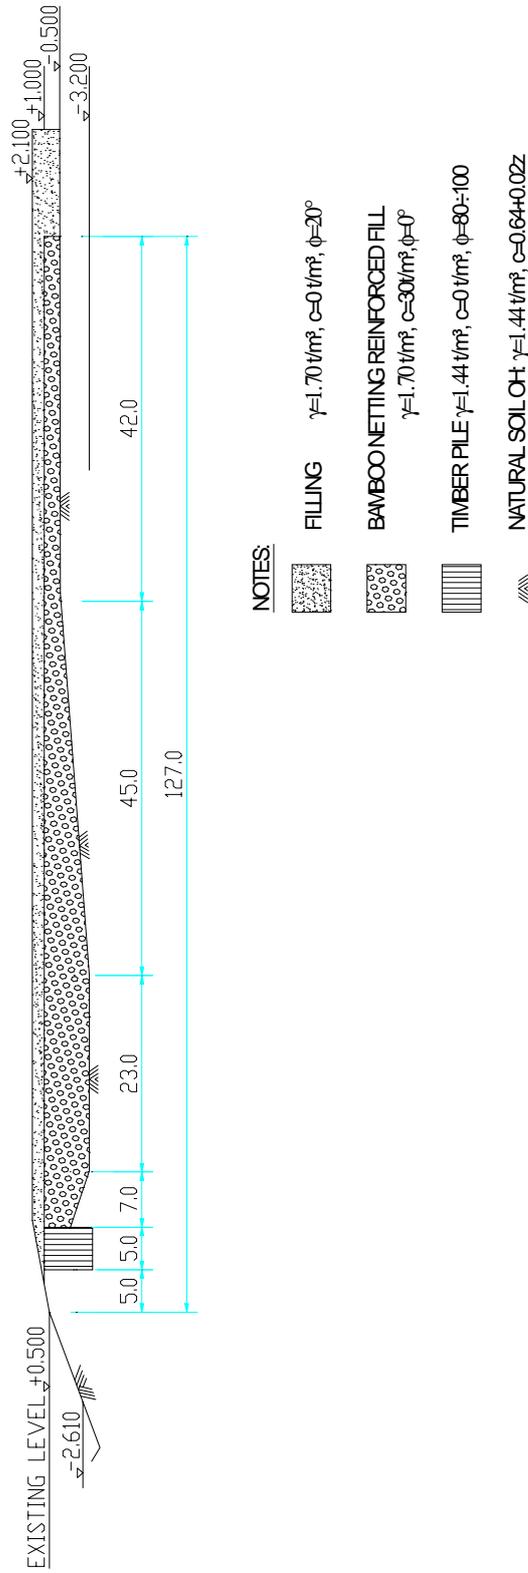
BAMBOO REINFORCED NETTING METHOD
